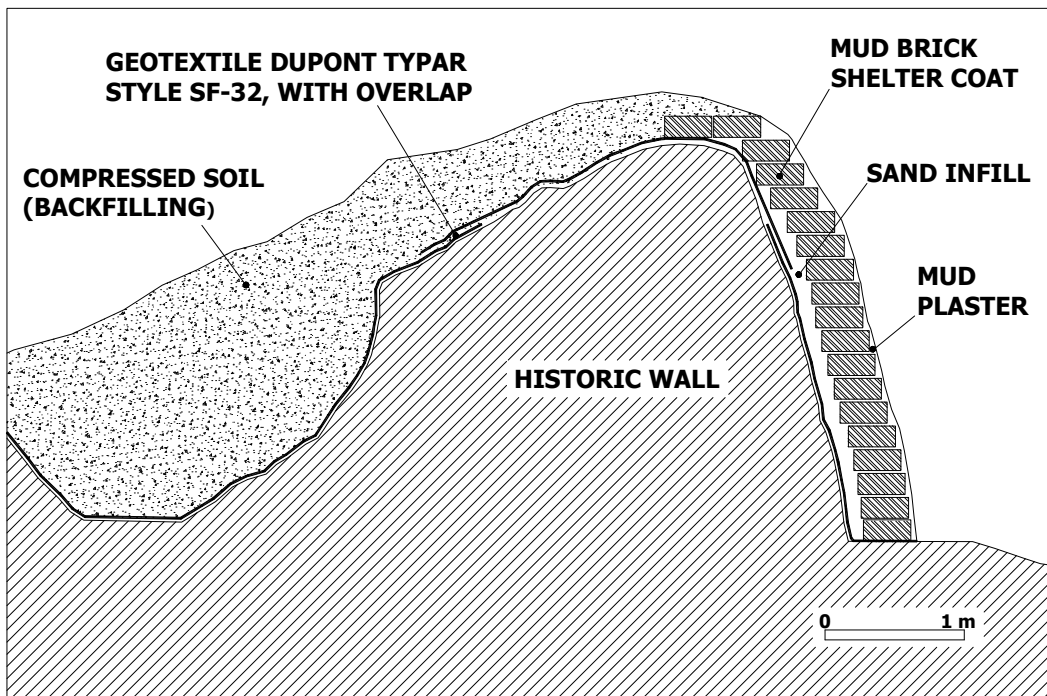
Drawing explaining shelter coating process (extent of historic wall is not defined). The portion on the left was backfilled as a conservation measure.
